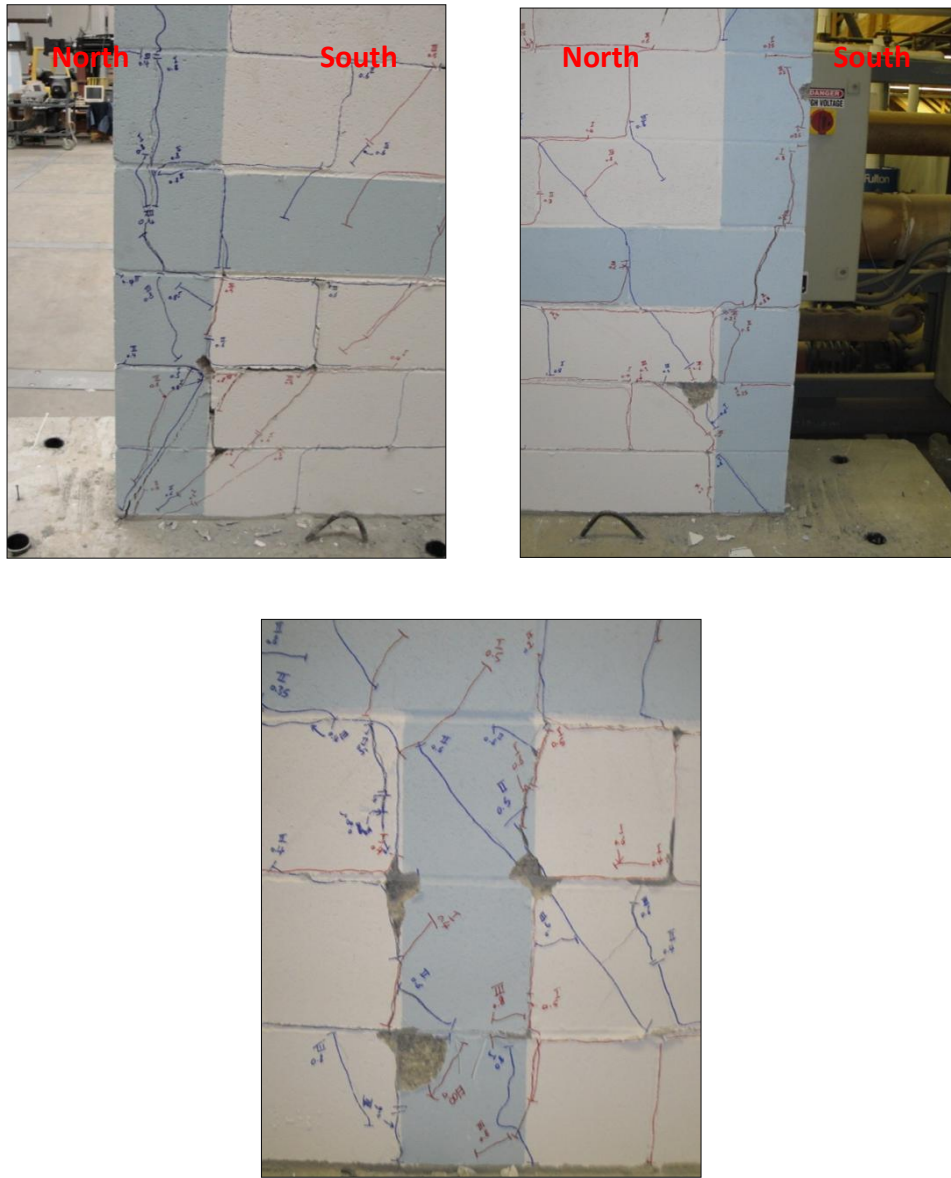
5 Vertical cracks prior to the end of the test , mortar spalling, and limited face shell spalling at drift angle of 0.88%
